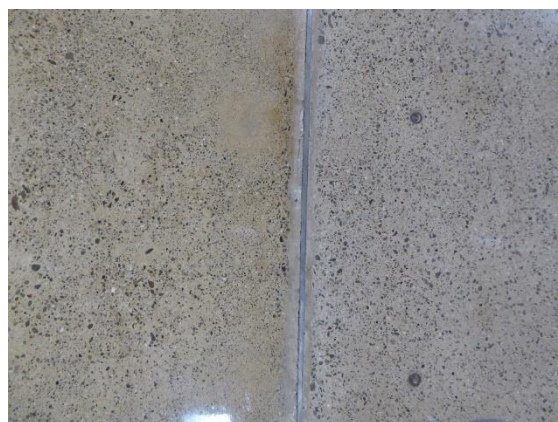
Preserved concrete floors in 380 Portage Avenue.
